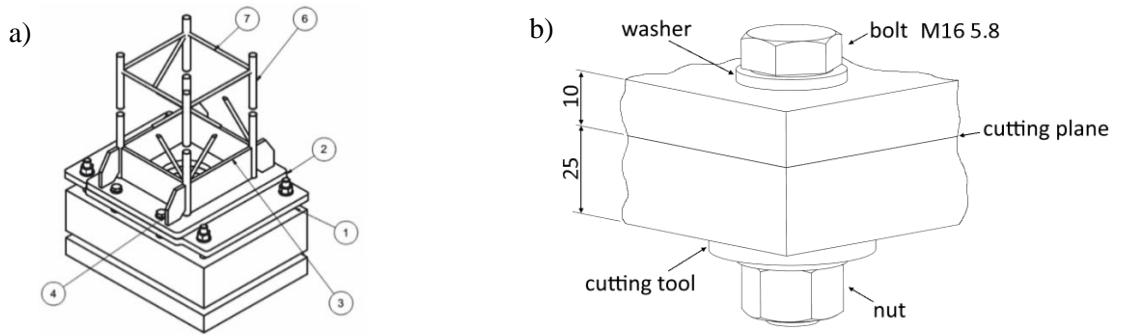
a) Foot of the supporting construction equipped with a safety connector (1-foundation, 2-anchor bolt, 3-frame, 4-safety connector, 6, 7- rods of girder); b) safety connector.
